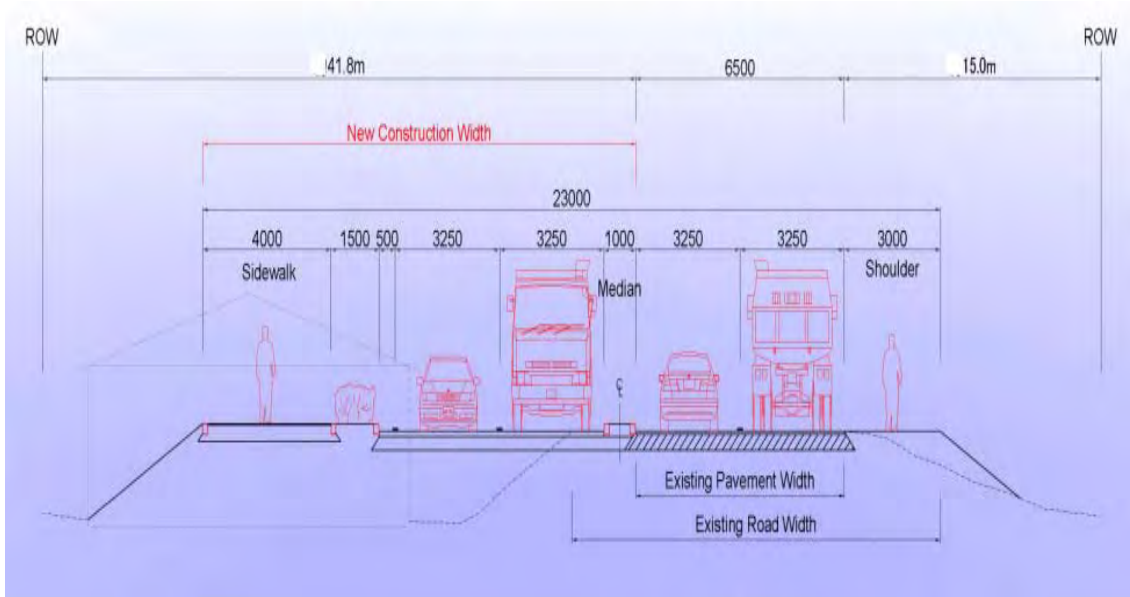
Tentative diagram and cross section of the proposed Somalia Drive (after Project completion).
